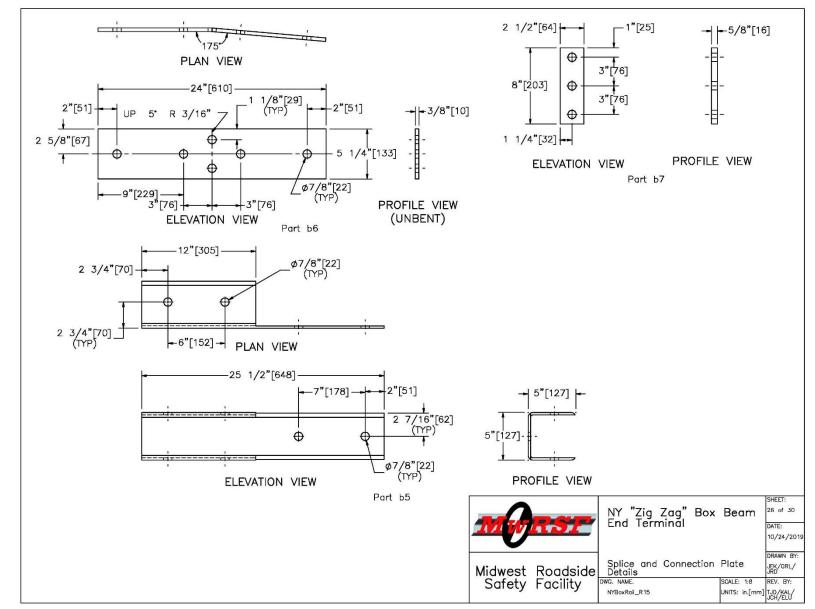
Splice and Connection Plate Details, Test No. NYT-1
